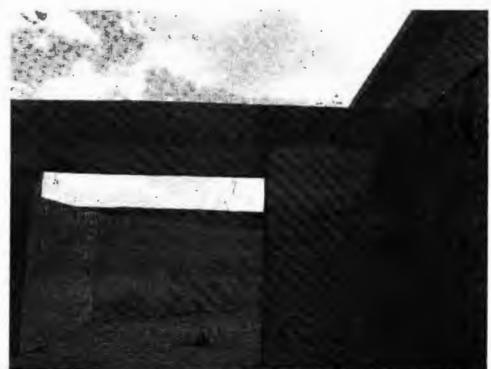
Breezeway roof. Typical construction (no isolation joints) at each Mosque in the compounds. Note the spalling from the breezeway and the mosque wall.
